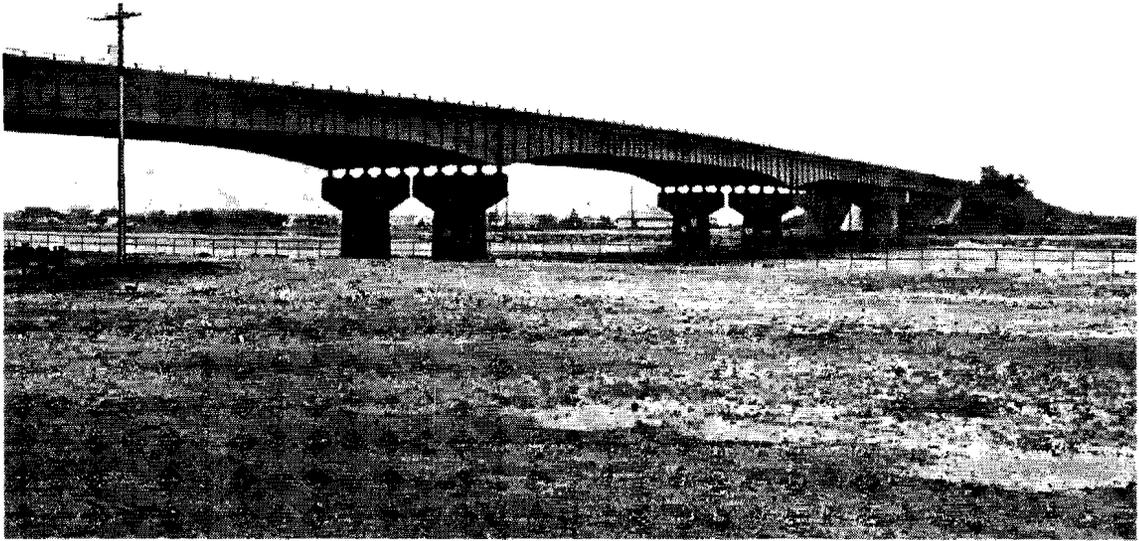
Existing Indian River Inlet Bridge. East elevation toward northwest.
